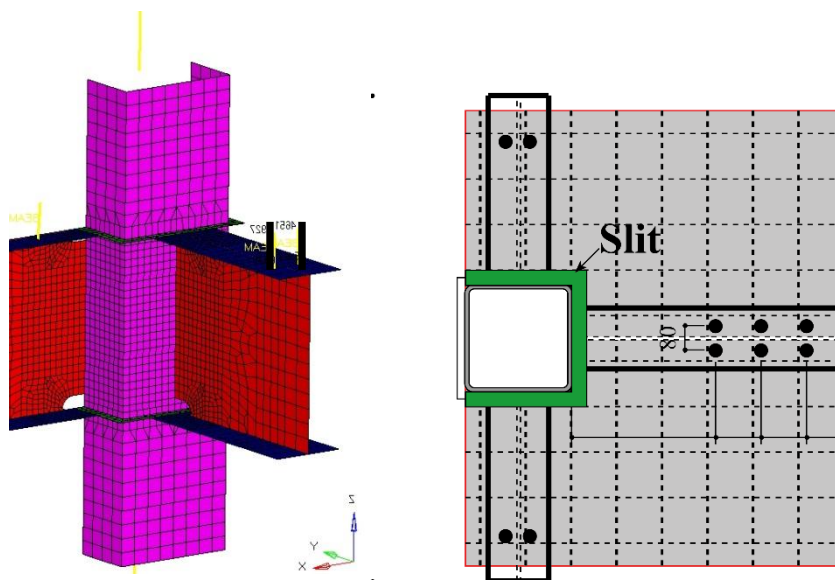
Movement of first stud of transvers beam away from the column face
